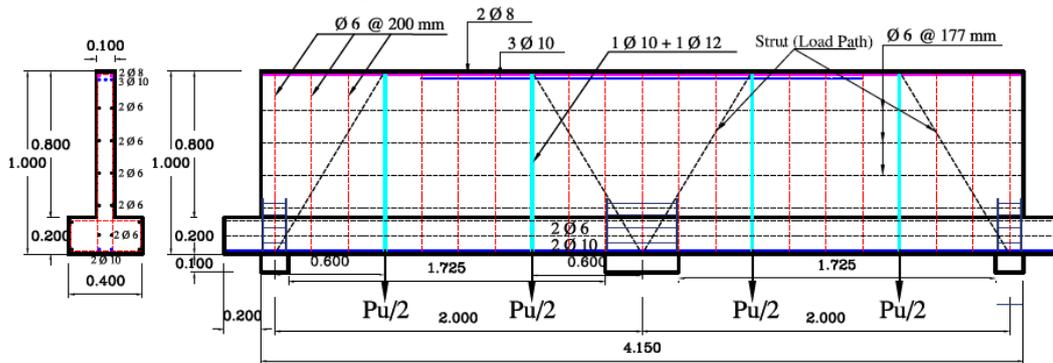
Detailing of Bottom Loaded Continuous Deep Beams Without Web Openings Tested byFarag A. 1999^[18].
